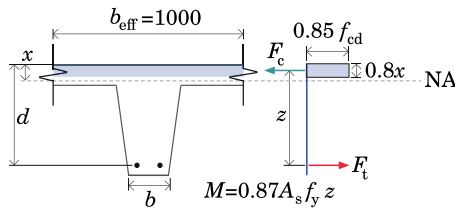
Grillage beam cross-sections can be designed as standard T-beam sections, leveraging a larger effective flange width when under sagging compared to the rectangular beam section width when hogging.
